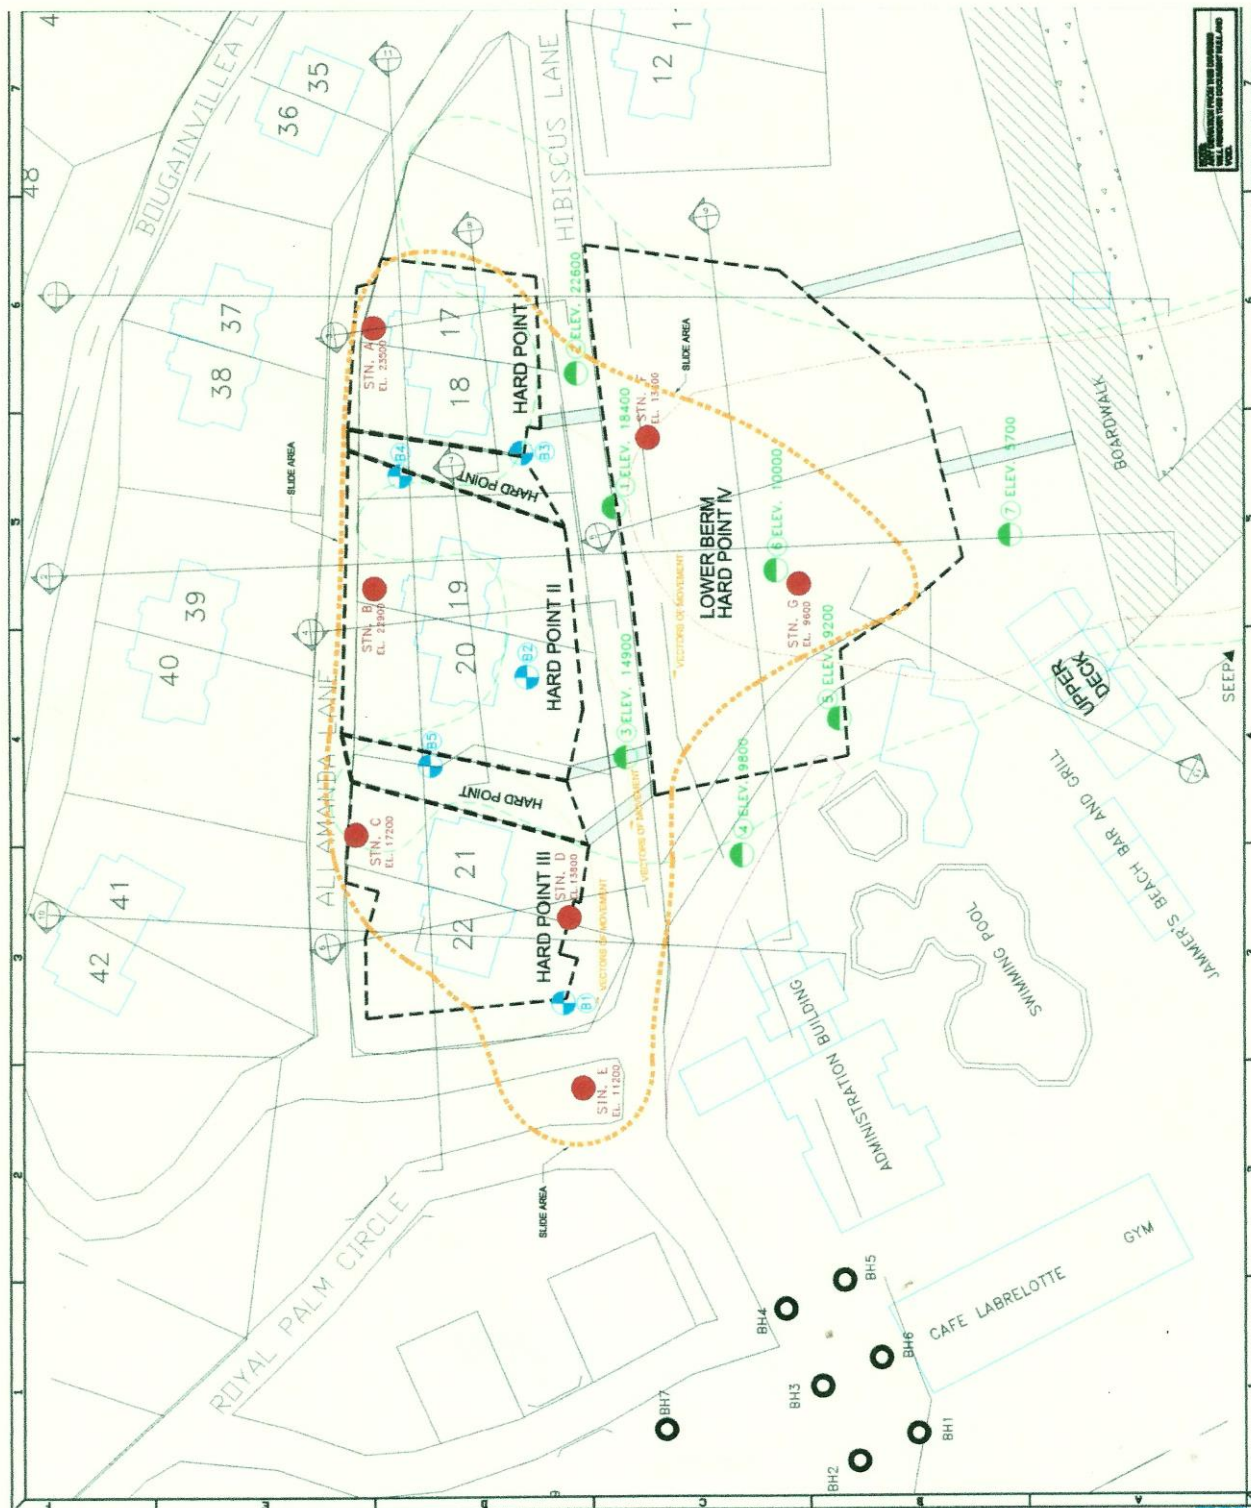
Plan of Cross-Sections for Slope Stability Analysis Windjammer Landing Beach Resort (After EllisDon, 2007)
